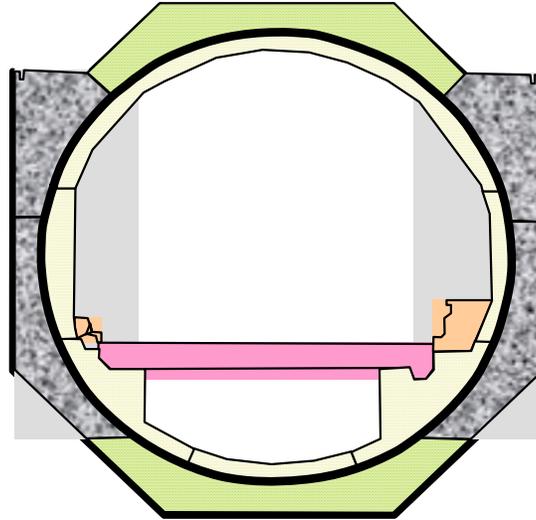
Double Shell - Second Hampton Road Tunnel, Virginia
